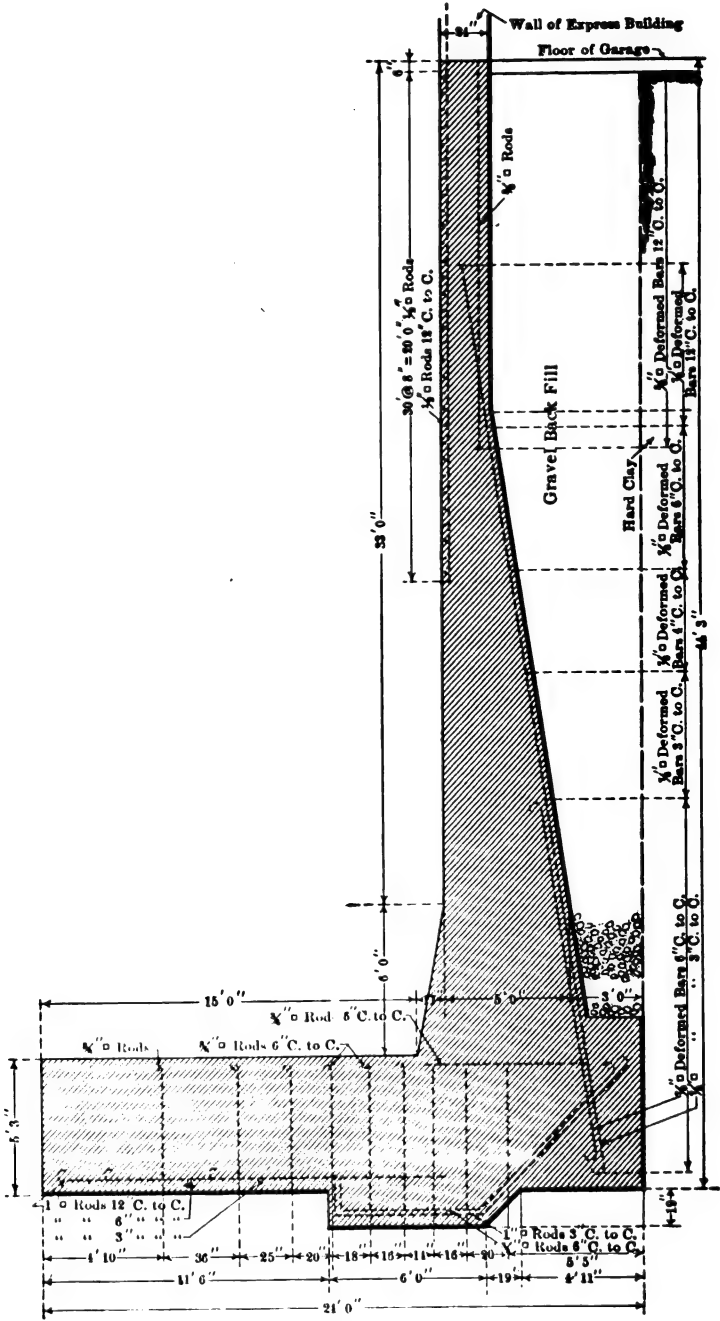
CANADIAN NOR. RY. WALL, MONTREAL.
